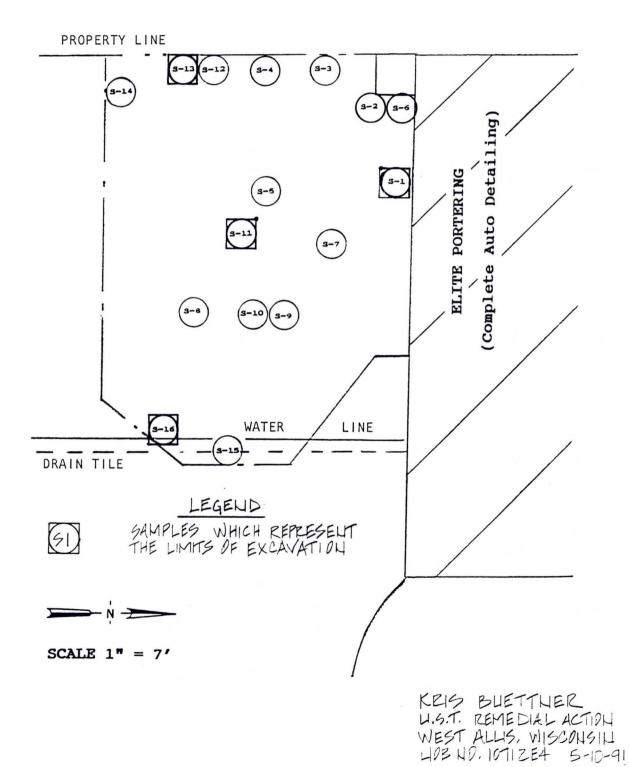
SOIL SAMPLE LOCATION PLAN-WEST EXCAVATION
